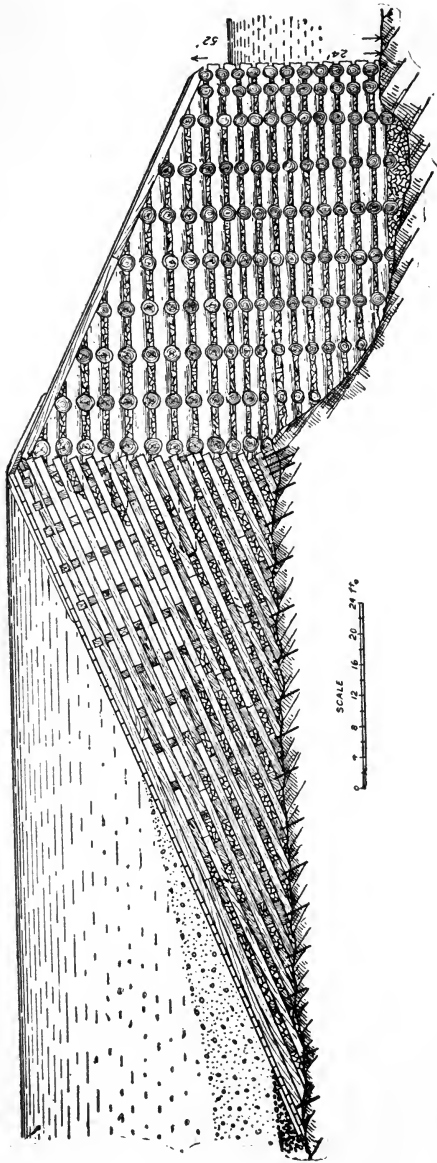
CROSS-SECTION OF HOLYOKE WEIR.
